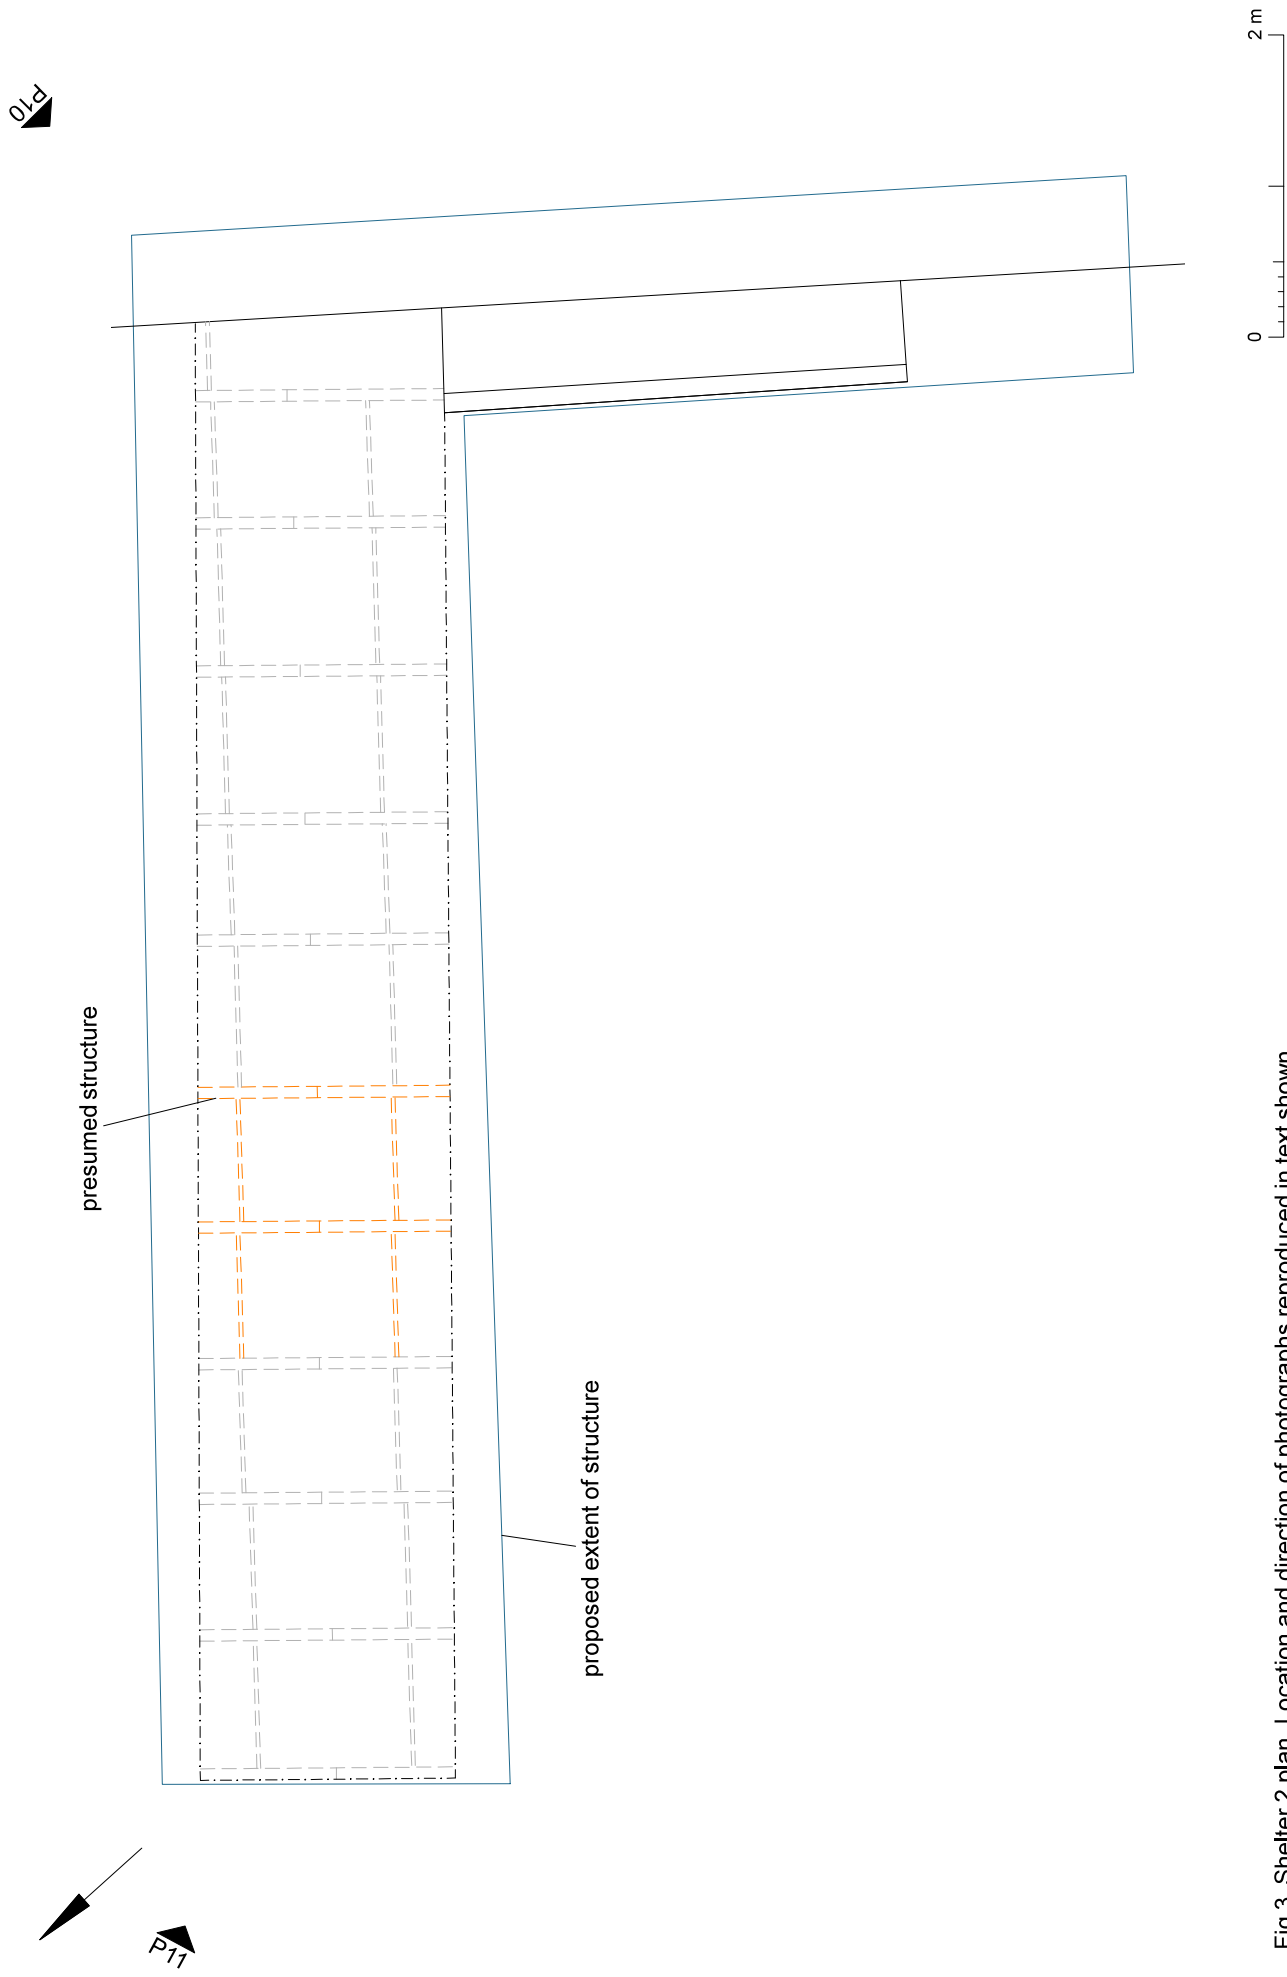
Shelter 2 plan. Location and direction of photographs reproduced in text shown.
